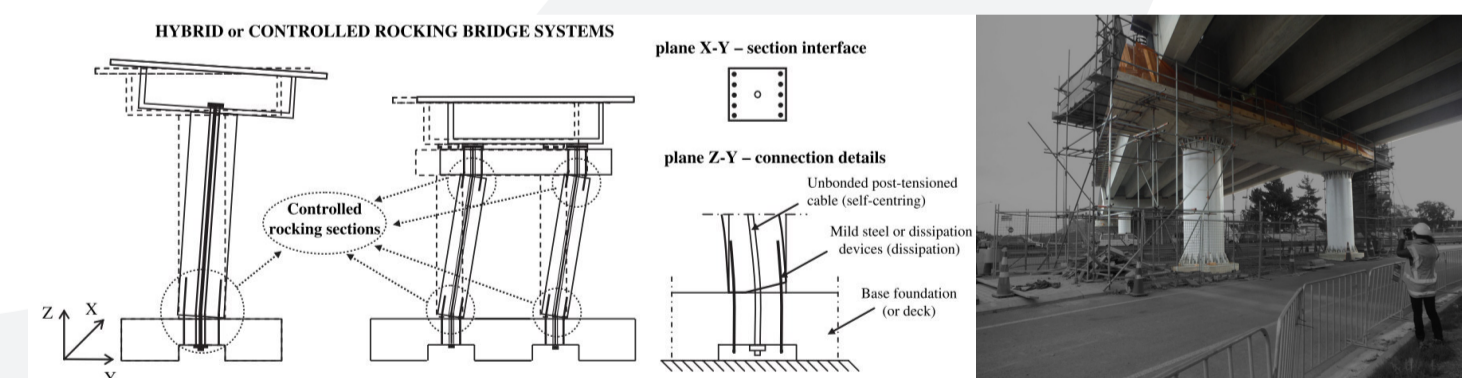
Implementation of DCR into bridge piers, concept left (Palermo & Pampanin, 2008) and right, real use in Wigram Magdala Bridge
